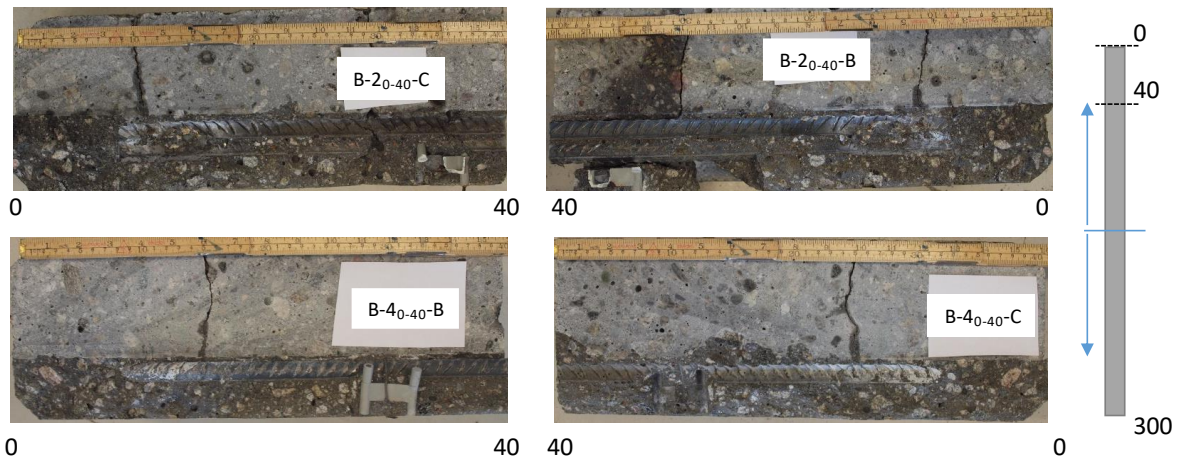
Steel-concrete interface of beam B section 0 to 40 cm. The large visible crack was due to the mounting of the pair of concrete beams. Near the crack white precipitate was observed at the steel-concrete interface
